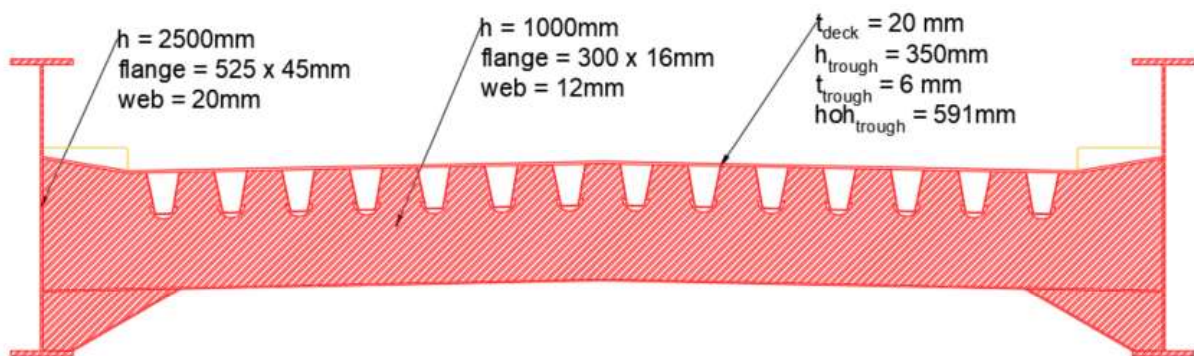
, Cross section MS base variant, steel main- and crossbeam and orthotropic deck.
